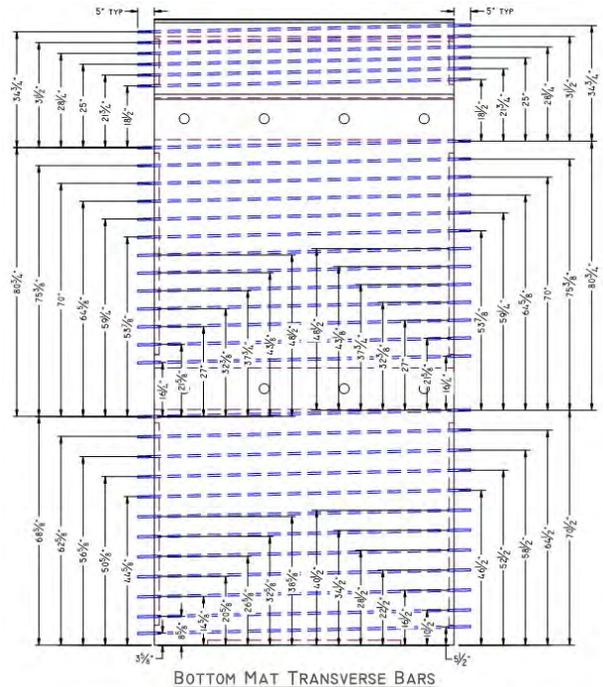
Skewed reinforcing bars in precast deck panel (Superior Concrete, LLC, Auburn, ME)
